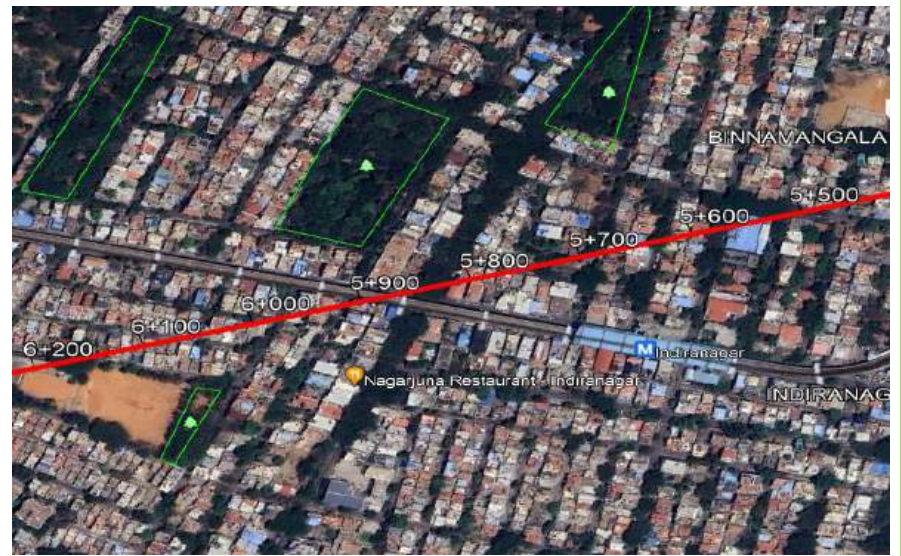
X-4 Legged near Indiranagar Metro station intersecting with Road and proposed Tunnel Alignment
